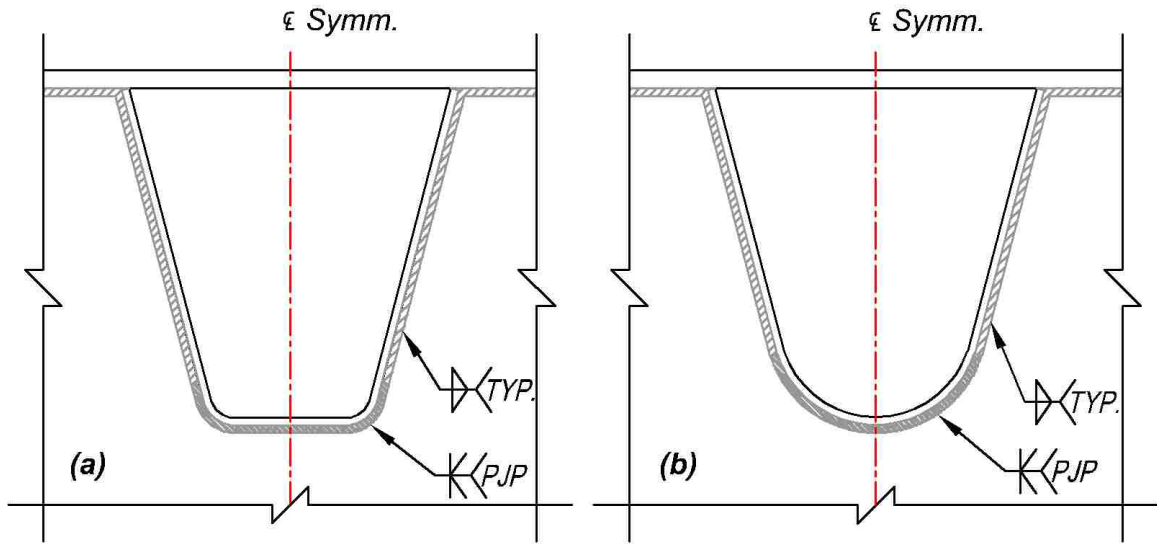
Type 1 rib-to-floor beam connection with alternate weld detail: (a) Type 1A with trapezoidal rib; (b) Type 1B with round-bottom rib
